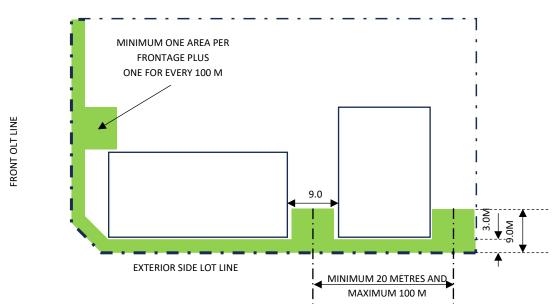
Front and Exterior Side Setbacks and Setback Areas
